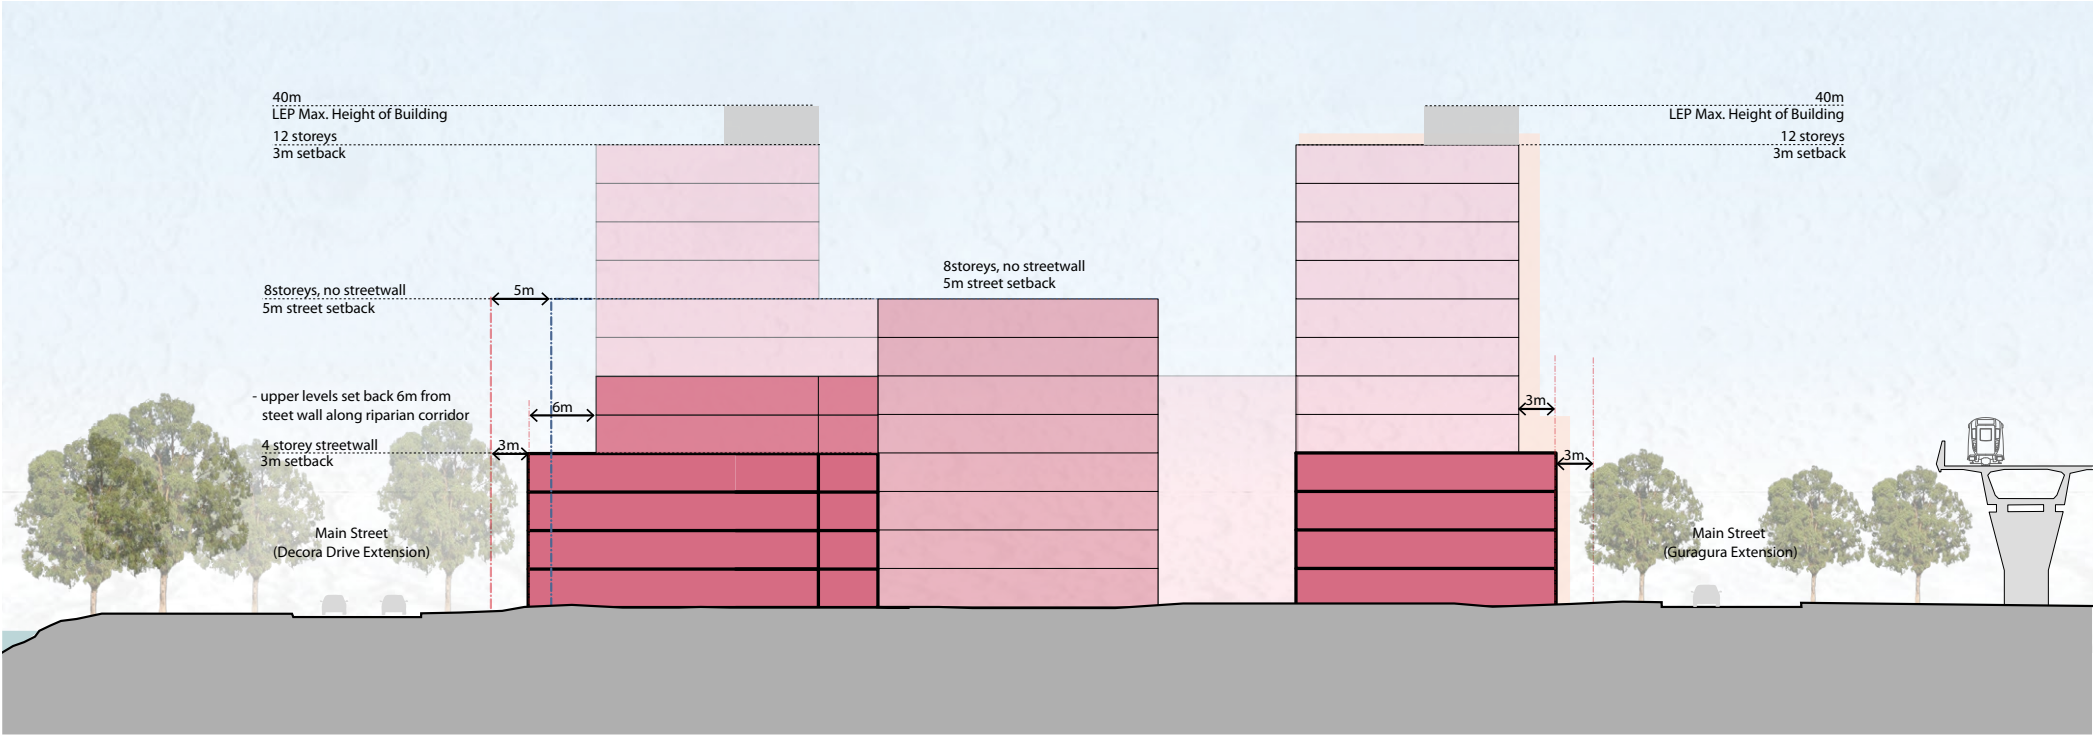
Proposed street wall setbacks in the Residential Core (Lots C)
